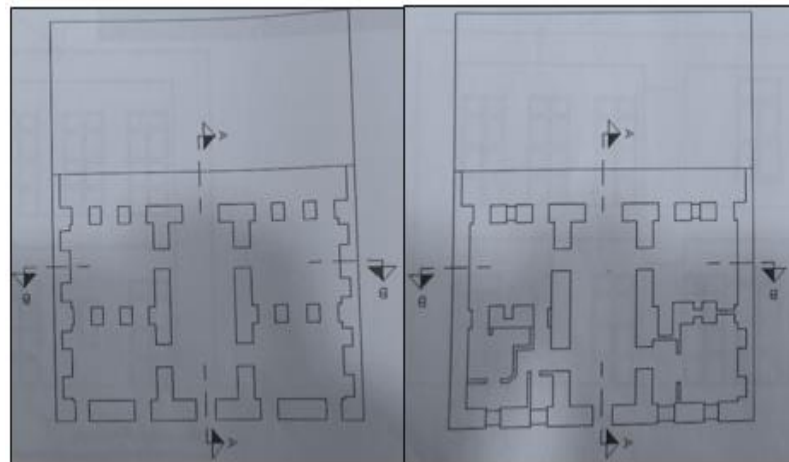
Ground floor and first floor plan of Khadivi House (Source: Zanjan Cultural Heritage Archive, 2007)
